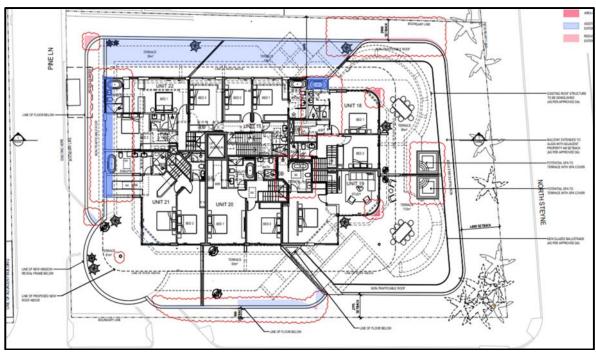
Level 4 Floor Plan; Squillace Issue B, August 2021
